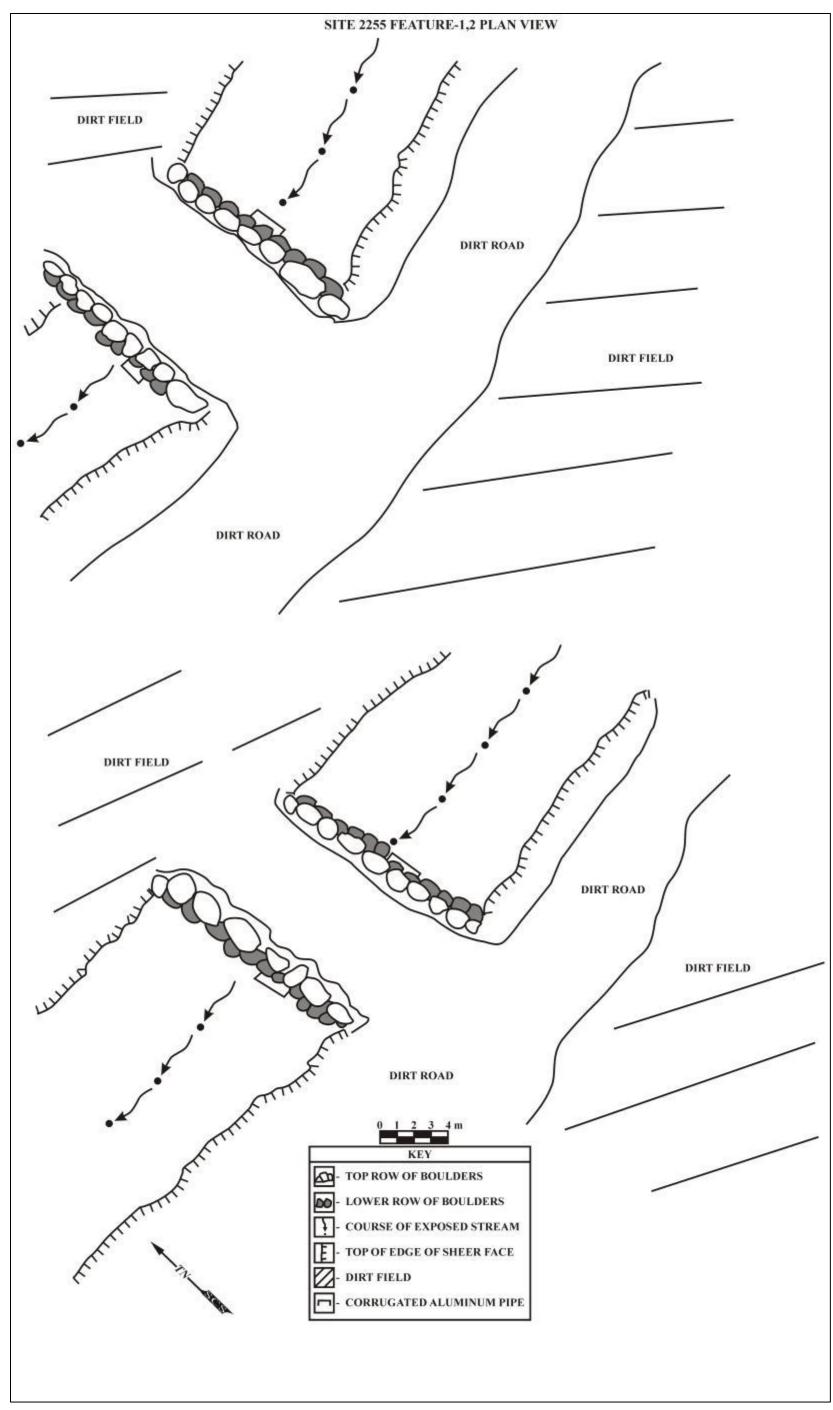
Plan view of Site -2255, Features 1 (top) and 2 (bottom).
